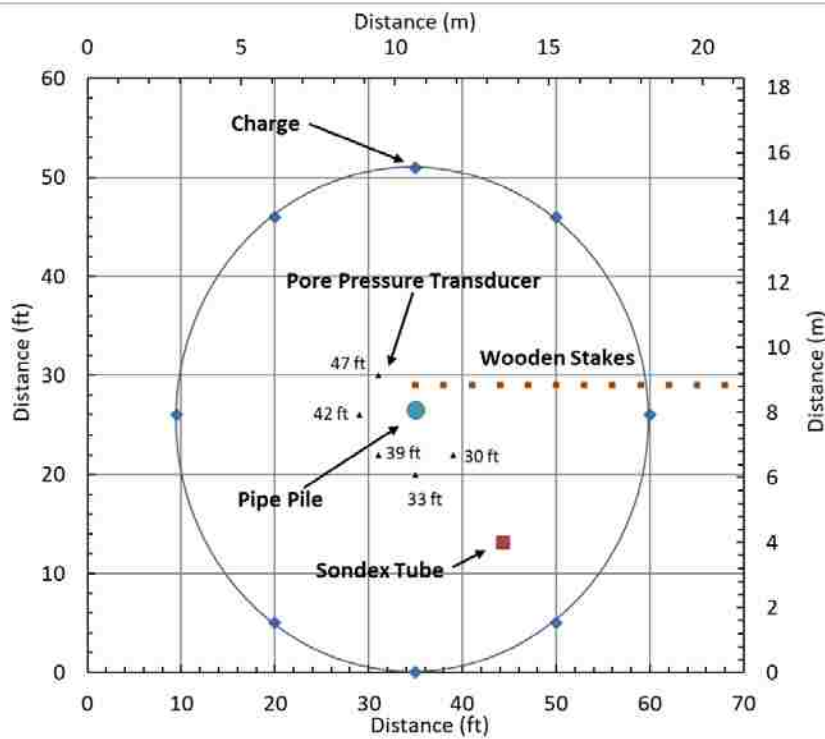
Detailed plan view drawing of the pipe pile with blast holes and instrumentation.
